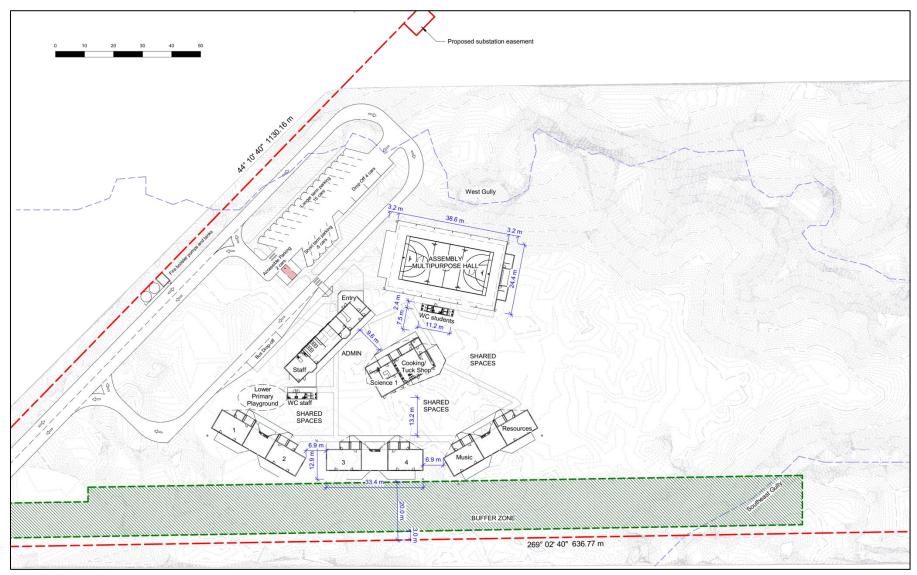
PROPOSED STAGE 4 PLAN
